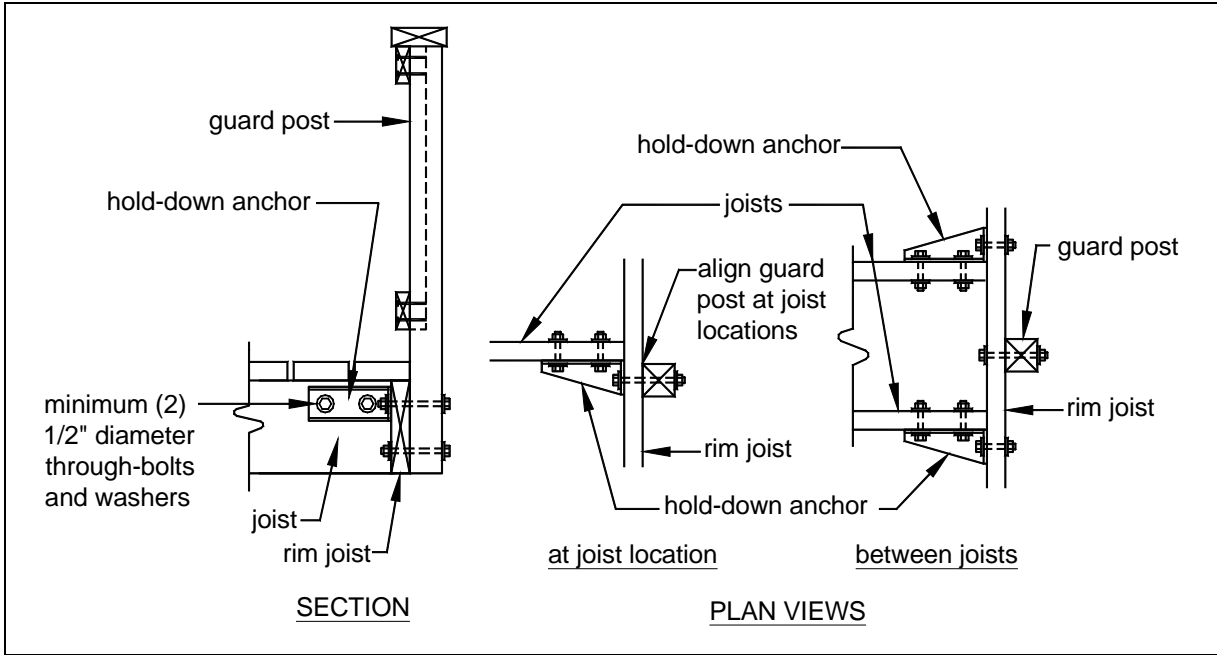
GUARD POST TO RIM JOIST DETAIL, OPTION 2
